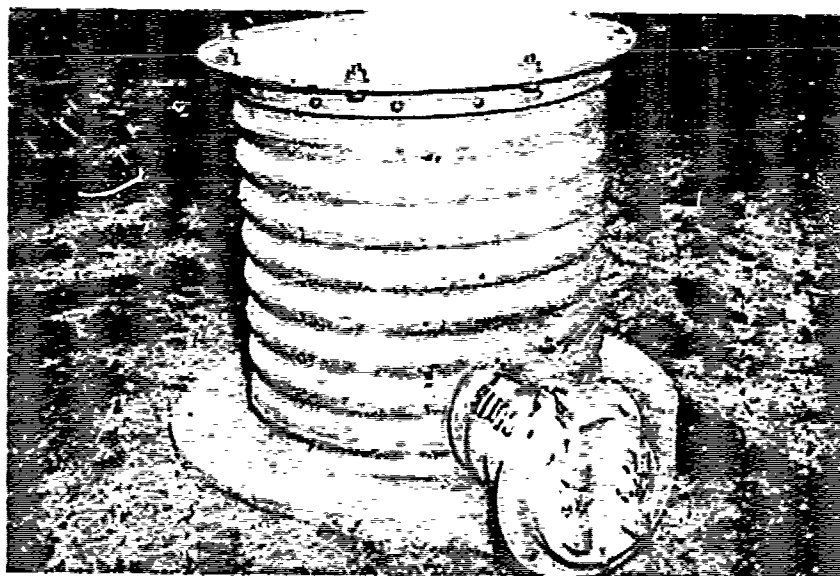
Well guard and outlet used in areas subject to flooding by sanitary or industrial sewage
